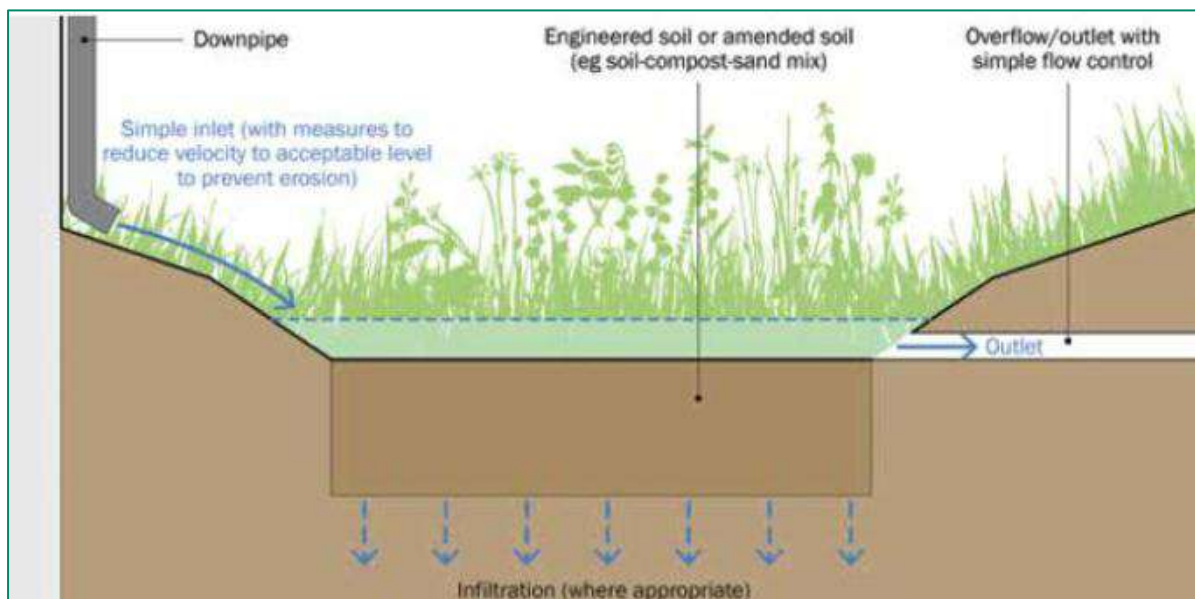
Typical Bio-Retention Section (Source: Ciria C753 The SuDS Manual)
